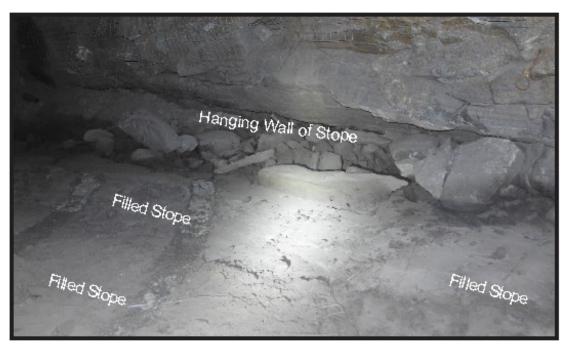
24 Level—Work Continues on Top of a Filled Stope Source: ERM
